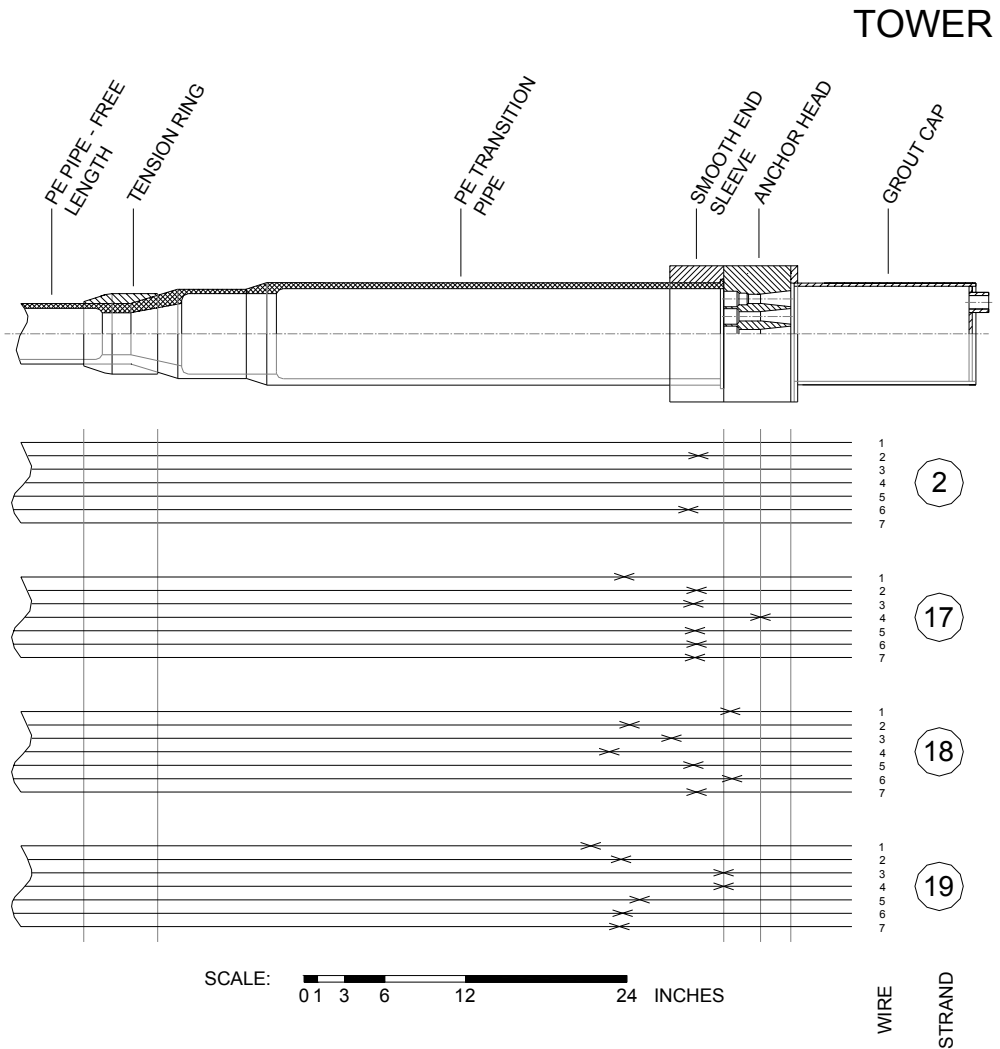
Location of wire breaks near tower anchorage - Specimen 10
